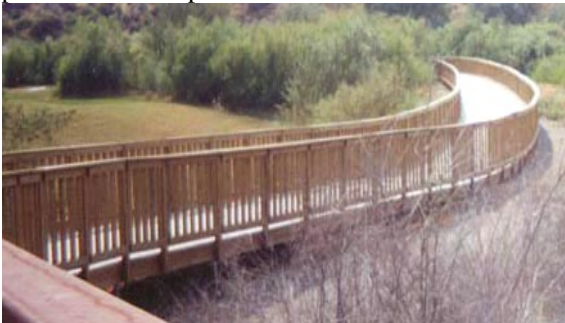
New boardwalk in marsh wetland supported on helical piles.
